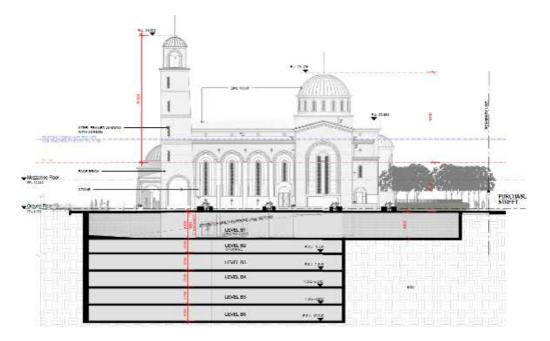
Extract of Eastern Elevation (Purchase Street) showing exceedance in building height. (Original Plans)
